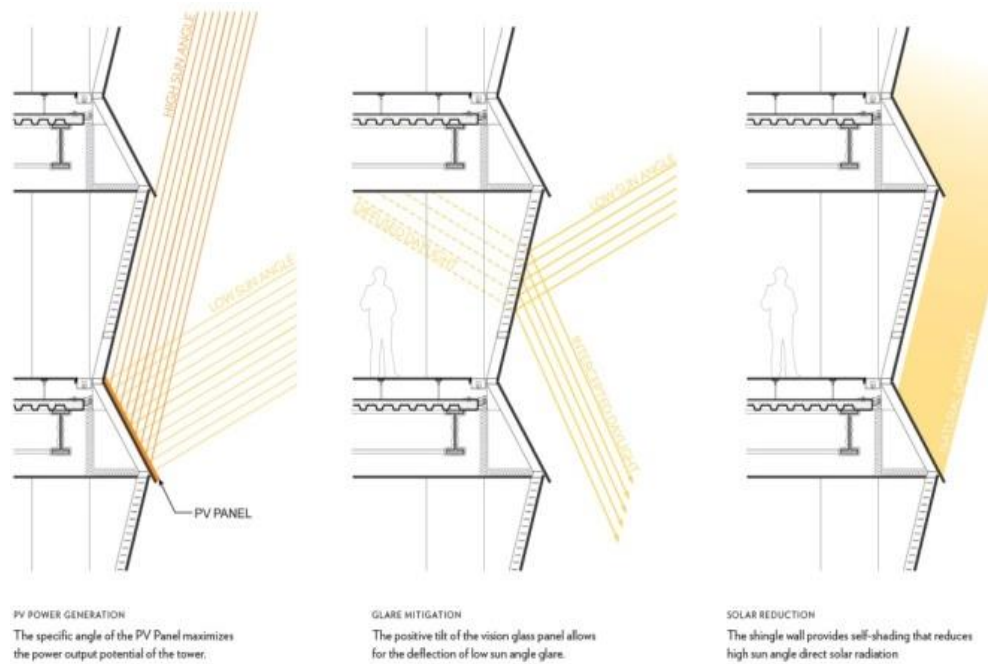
FKI Tower Exterior Wall, Seoul, North Korea
